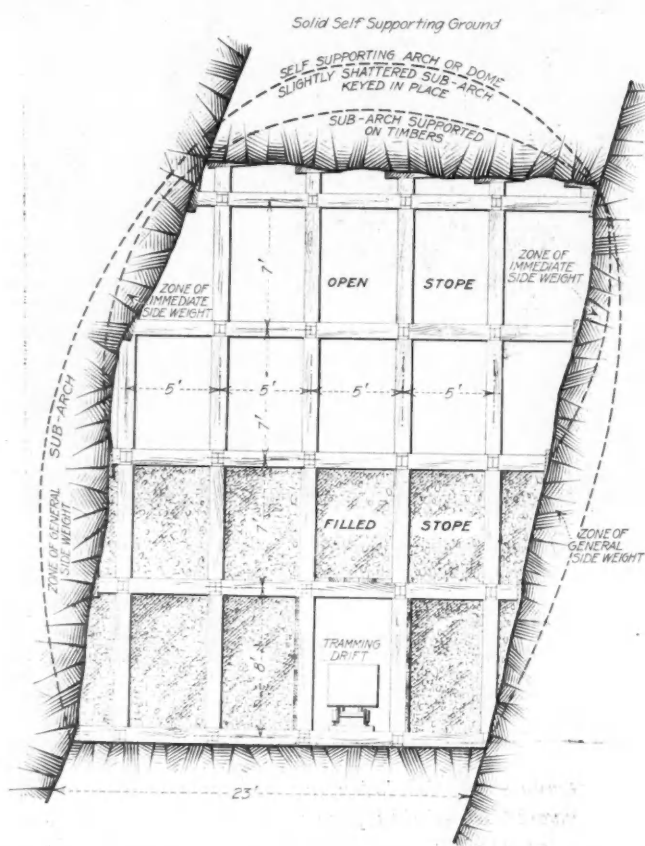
CROSS SECTION OF TIMBERED AND PARTLY FILLED STOPE, SHOWING ZONES OF WALL AND BACK ARCHING
